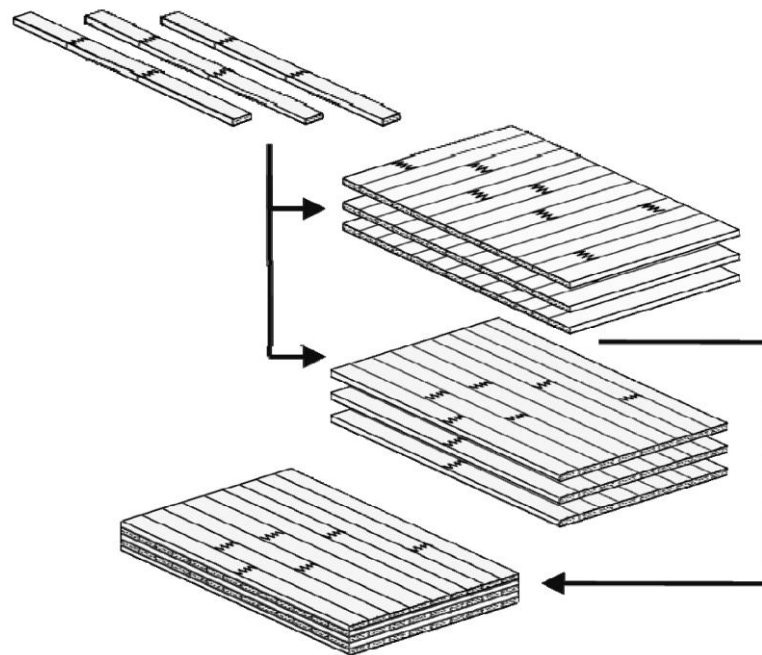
Schematic view of XLAM manufacturing process [Promo_legno].
